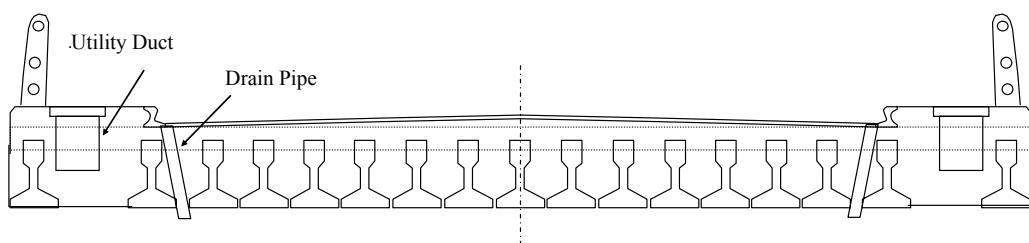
Standard Cross Section of Pretension PC Girder Bridge
